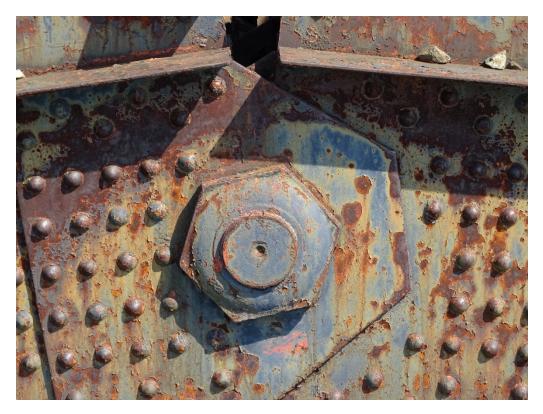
Close up Photograph of Arcola Bridge Pin Detail Photo 4.
